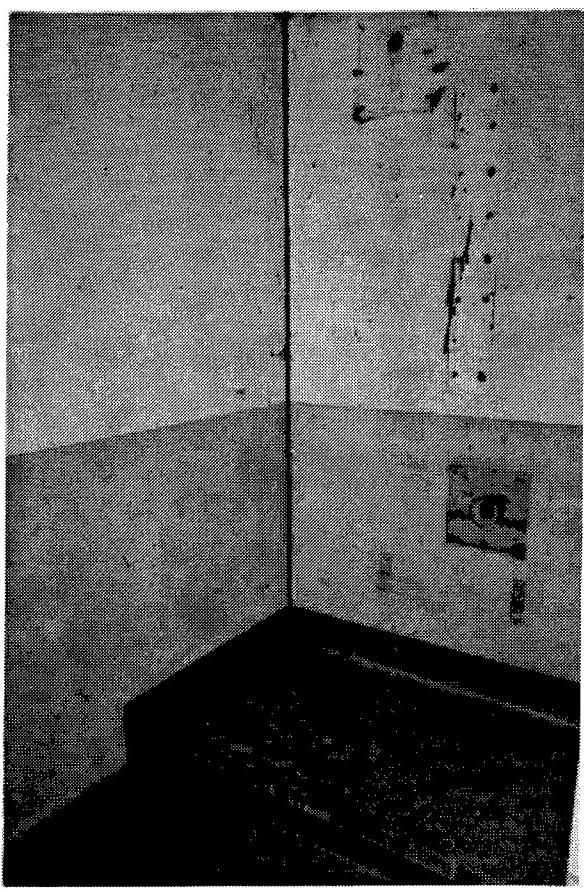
Building DT-7: Interior view of this Metal Parts Loading Building.
